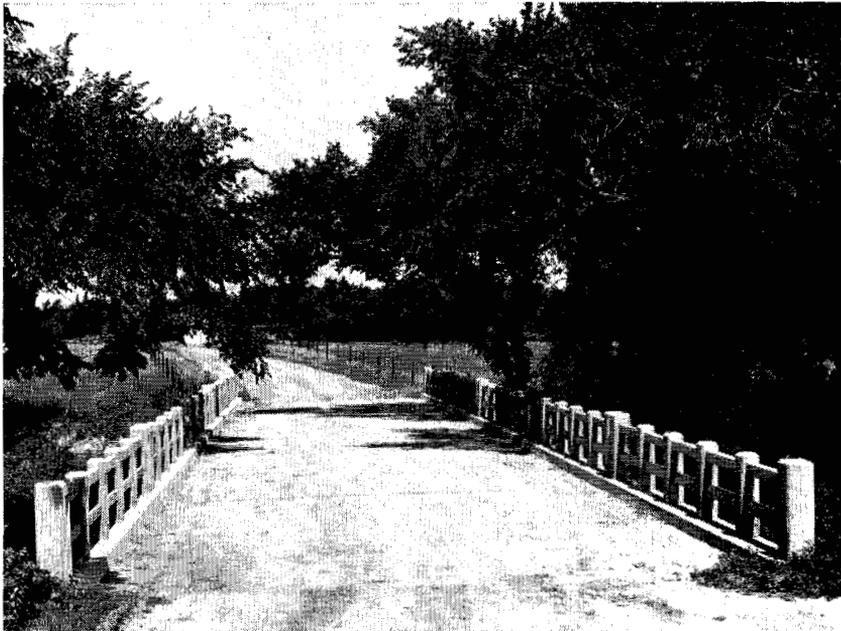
This high level reinforced concrete bridge was constructed in 1929 at a cost of \$12,858.
